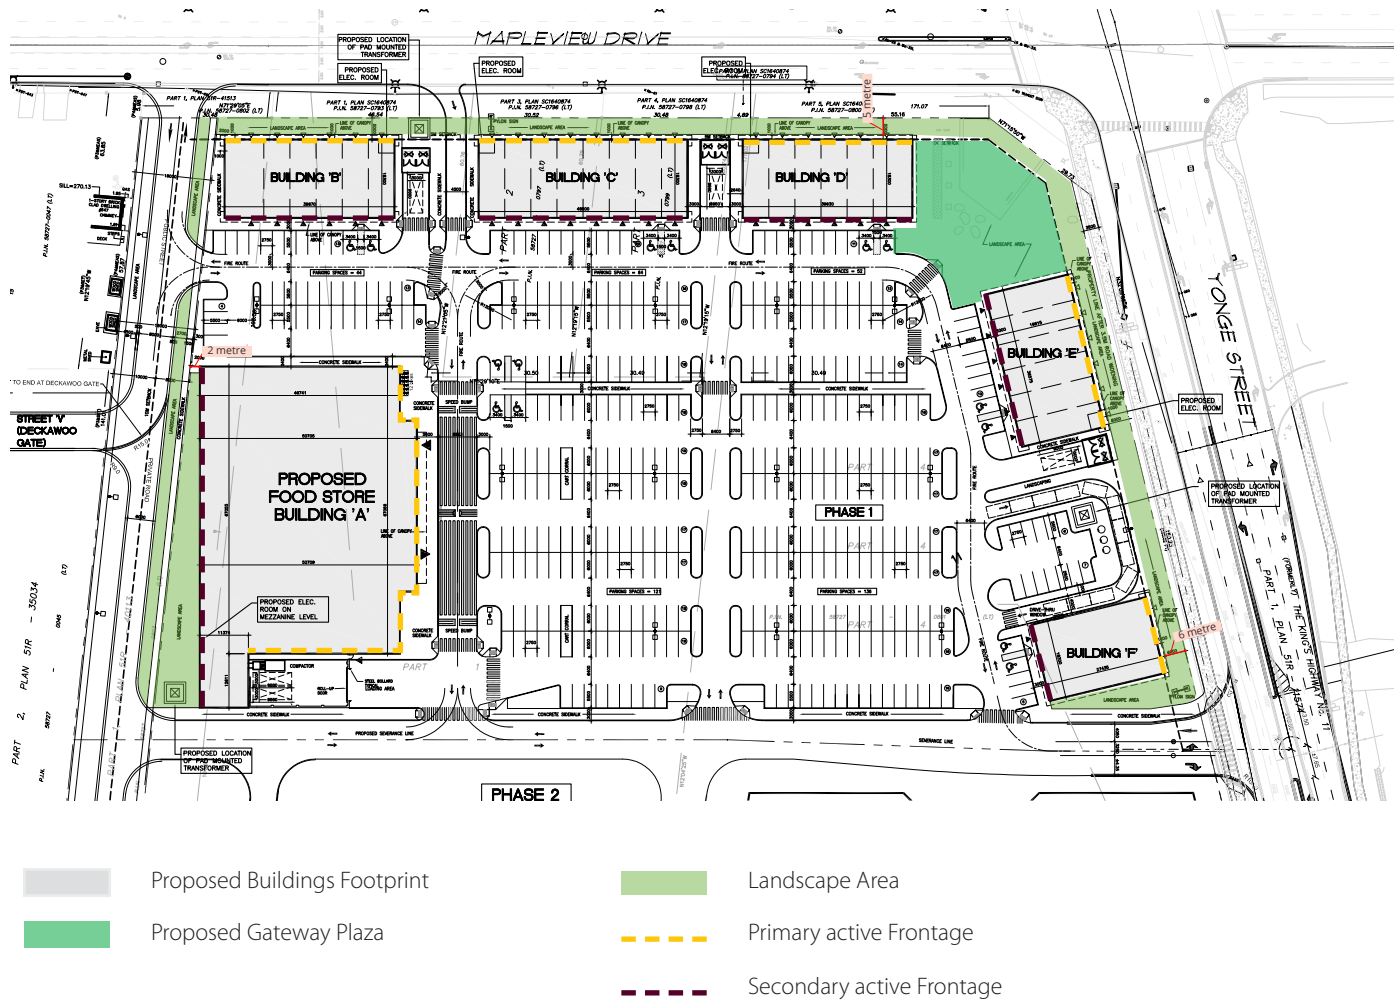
Site Plan showing the proposed buildings orientation and placement throughout the Site
